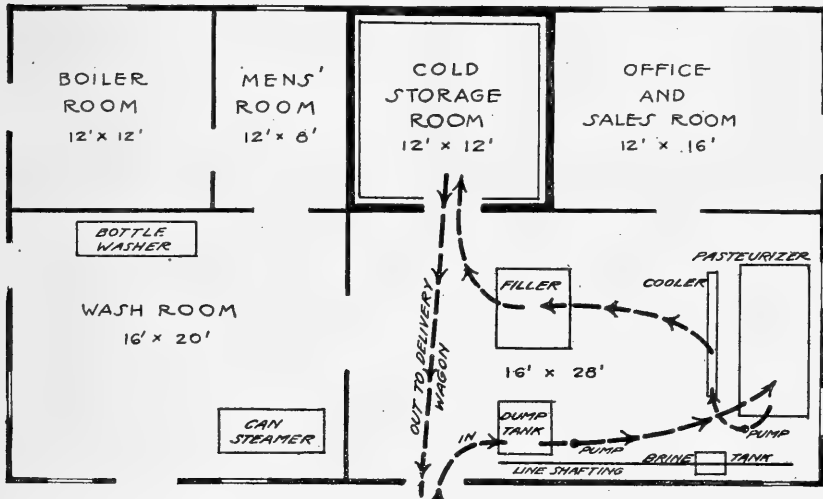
Floor plan for a 1-story plant of about 500 gallons' daily capacity, showing course of milk through plant.
